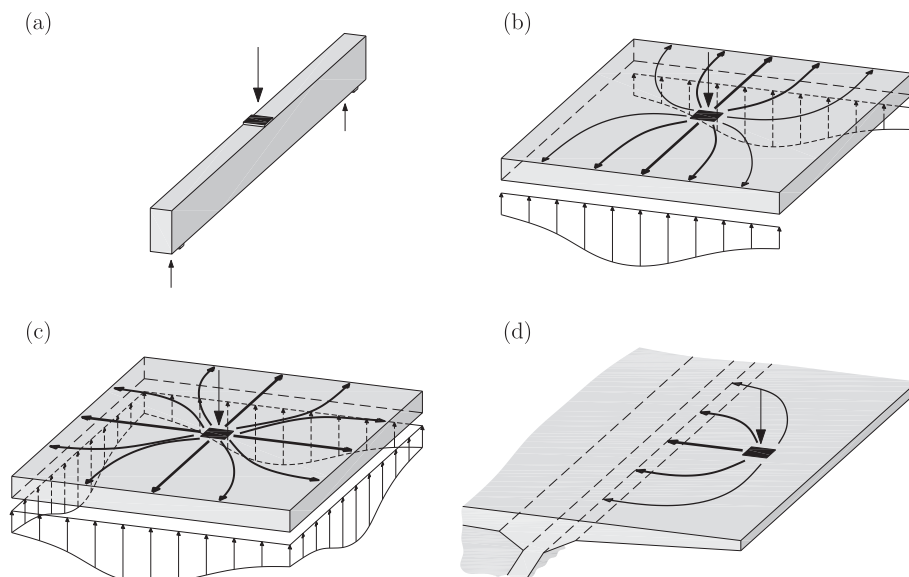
Structural reinforced concrete members failing in fatigue shear loading: (a) simply supported beam; (b) slab supported on two edges; (c) slab supported on four edges; and (d) cantilever slab.
